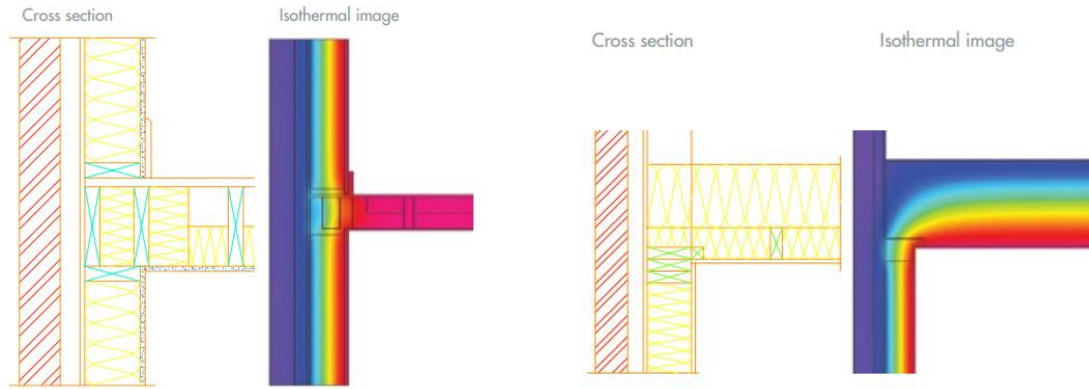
Junction with an external wall and an intermediate floor within a dwelling (left) and Junction with a party wall gable, insulation at ceiling level (right) [40]
